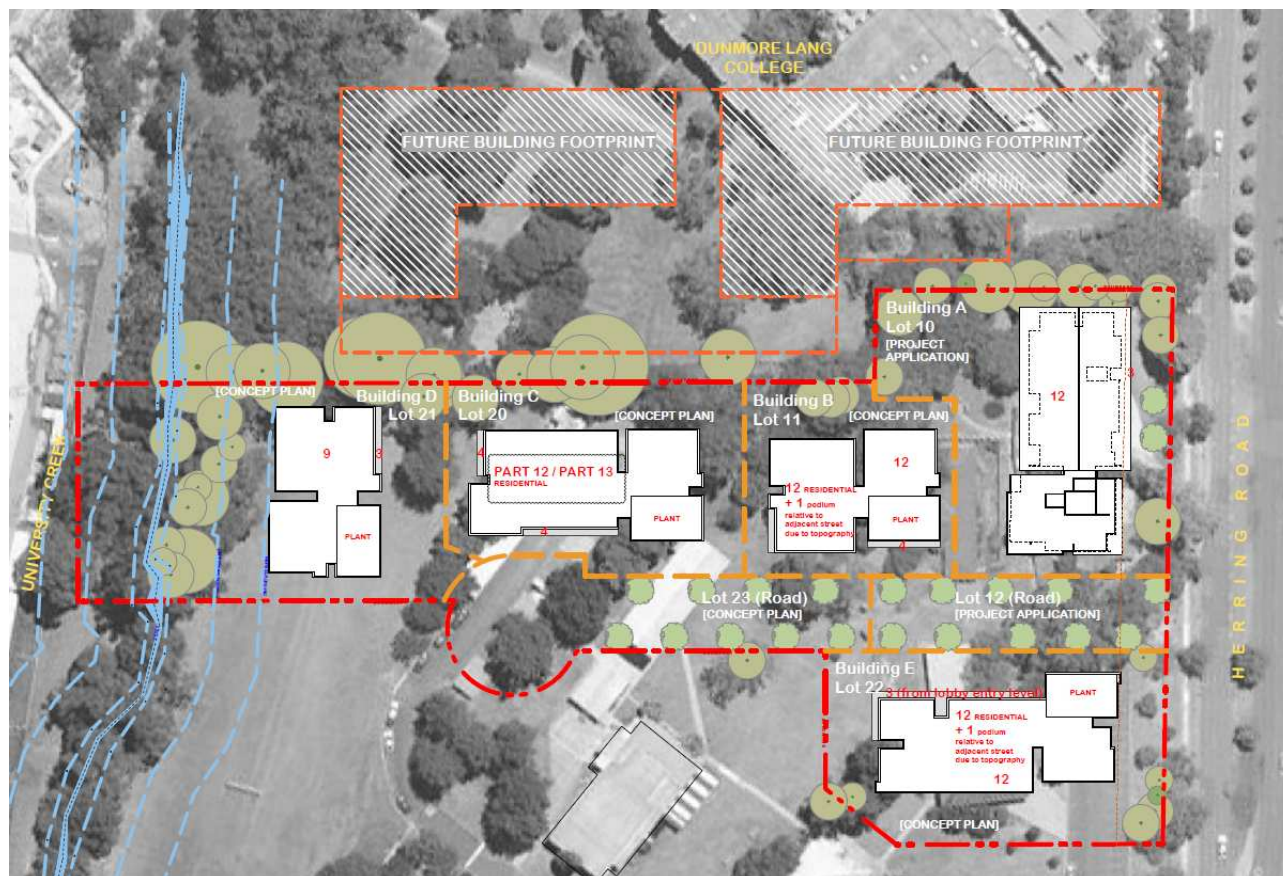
Site Context Plan demonstrating the layout of the 5 buildings and internal road.
